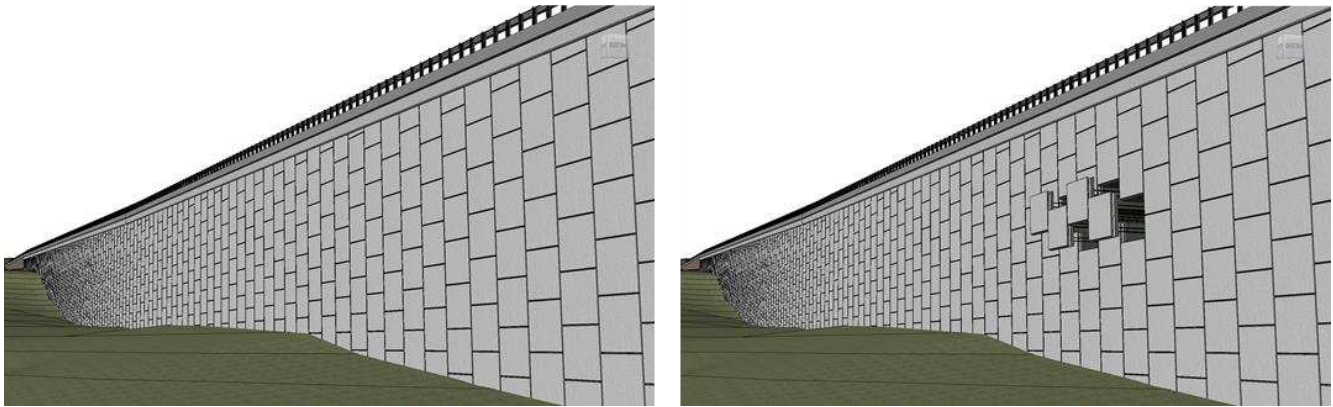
3D view of the MacRes system digital model showing the Paraweb geostrips and wall elevation.
